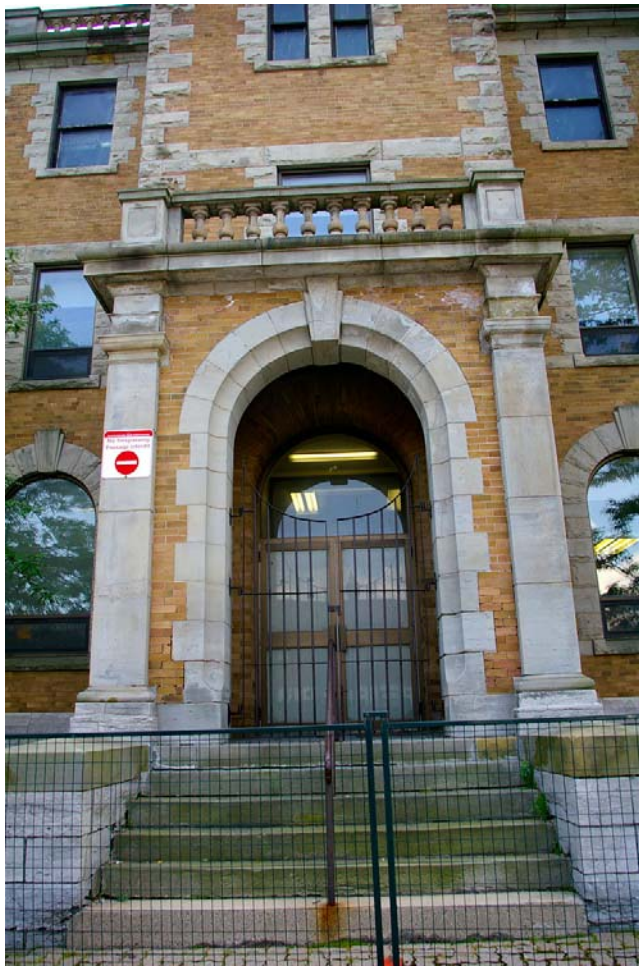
(left): Portico looking up the front staircase to the landing and the 1979 front doorway, which is no longer functional. The original bottom stone step has been replaced by a poured concrete one.
